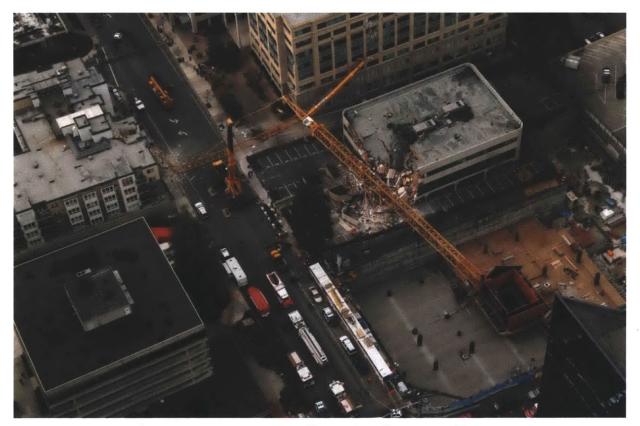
A tower crane collapses in Bellevue, Washington. (Haag Engineering Co.)
